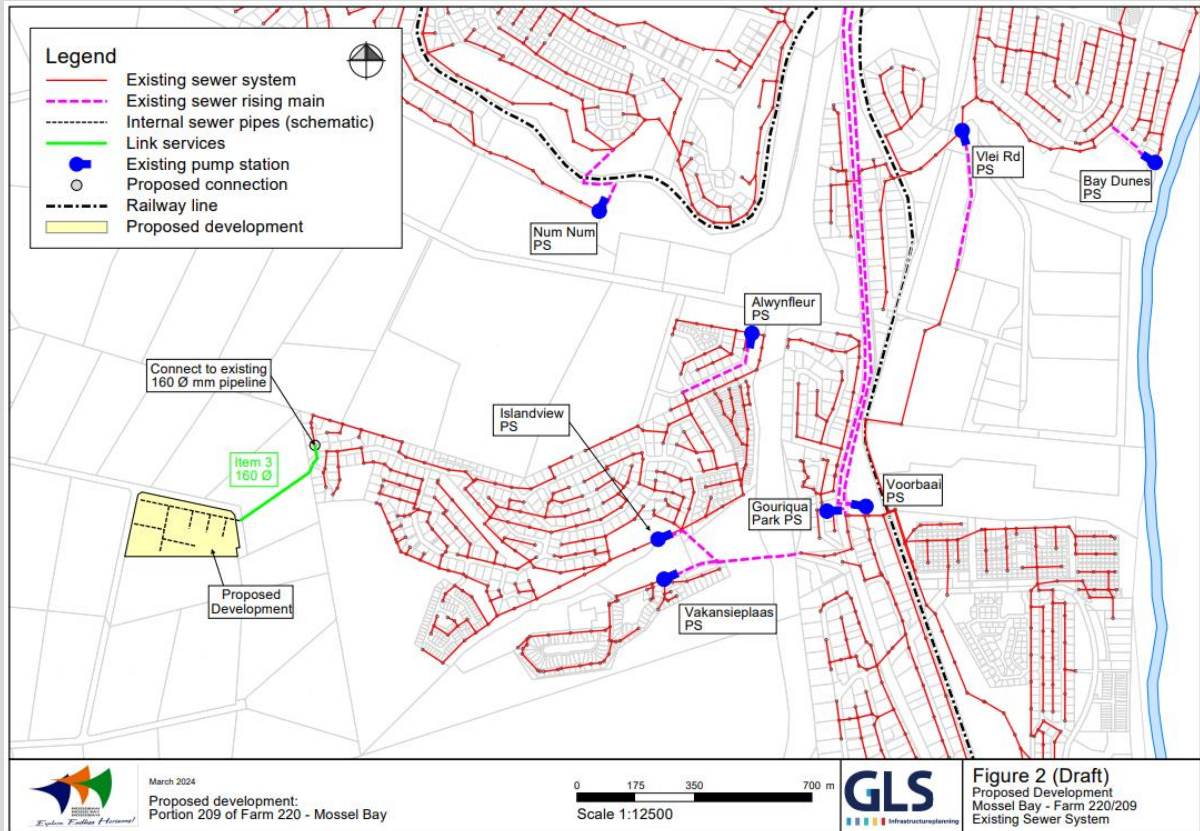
Proposed link (green line) to connect the proposed development to Island View Pumpstation as per the Municipal Master Plan for the area.
